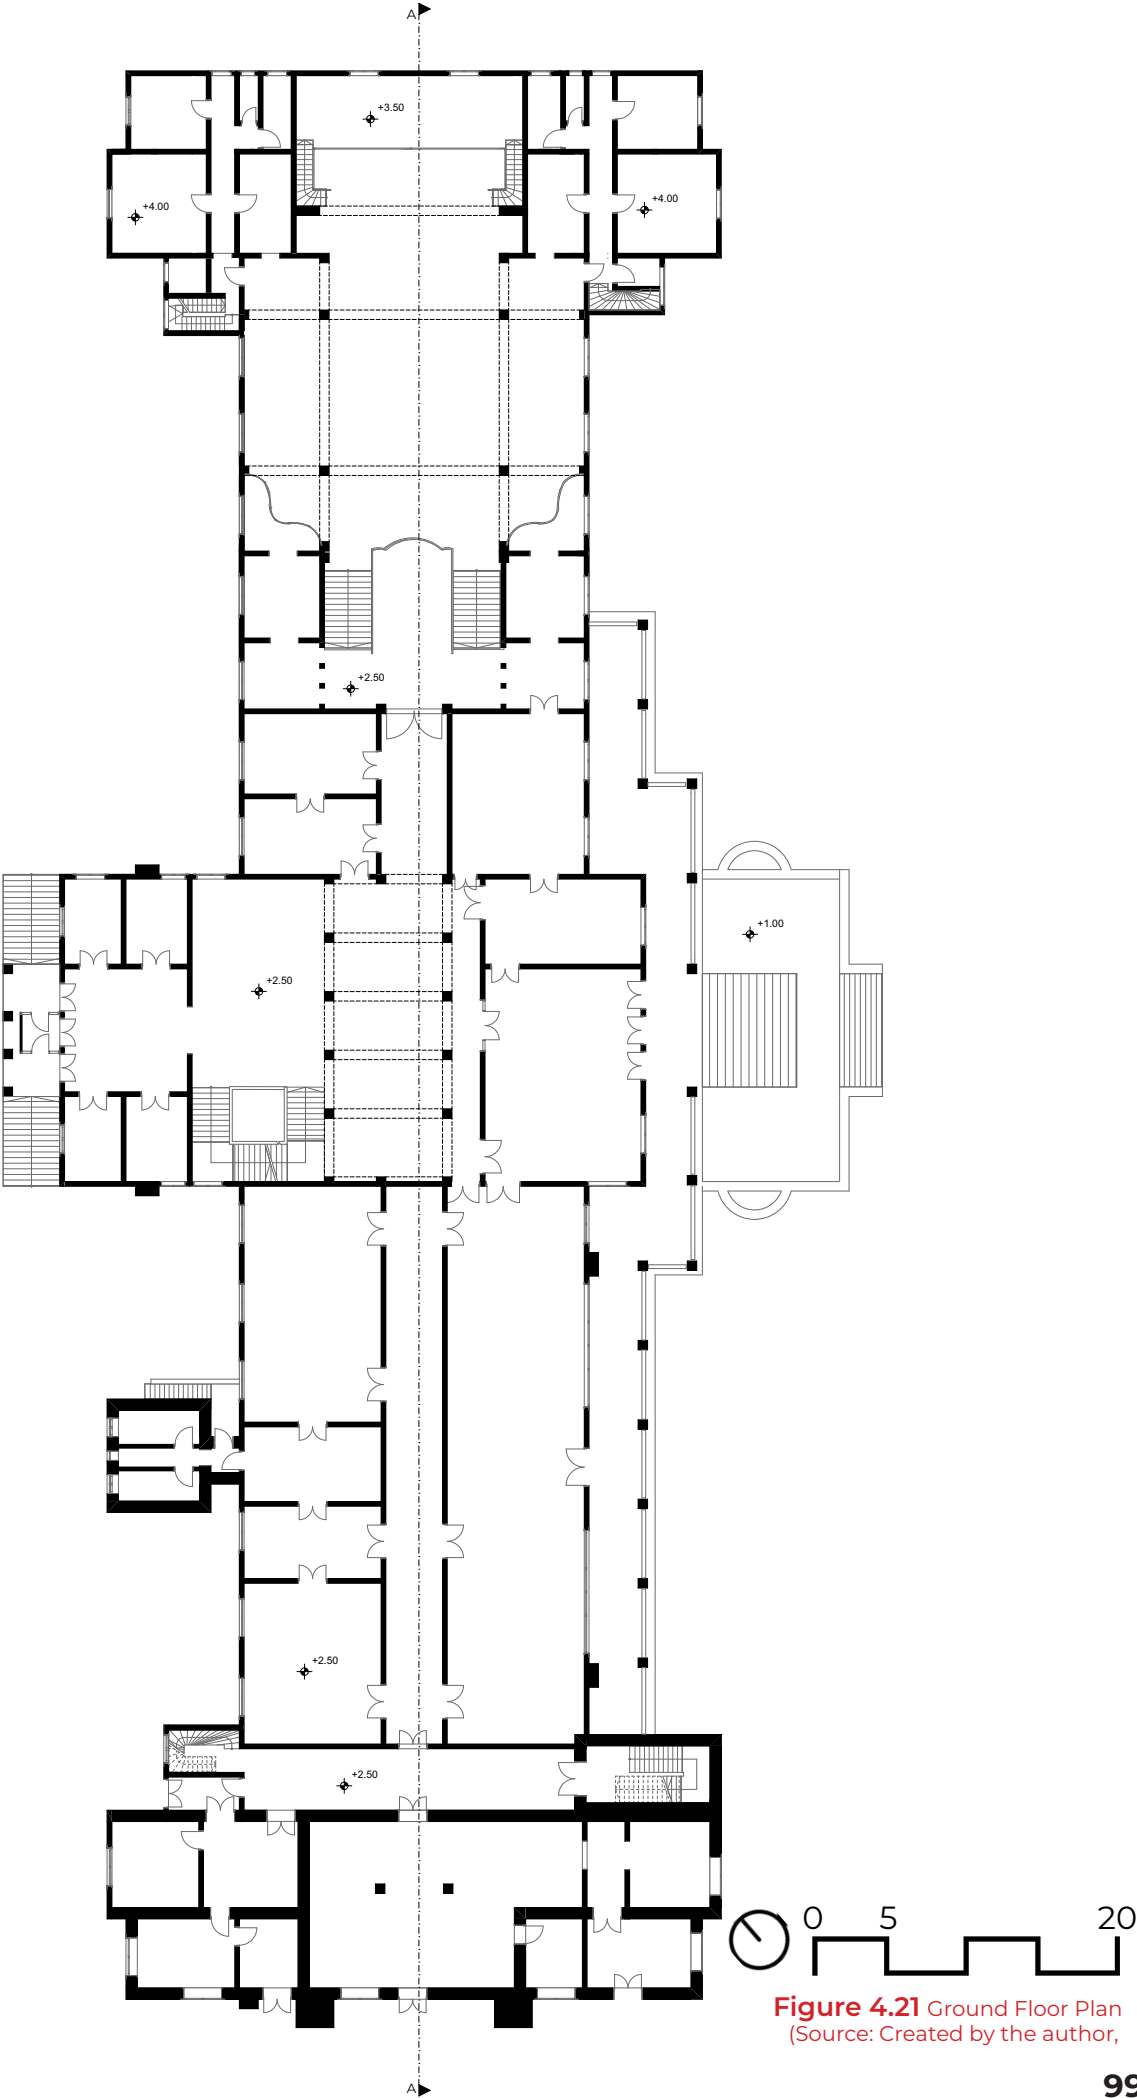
Ground Floor Plan (Source: Created by the author, 2024)
